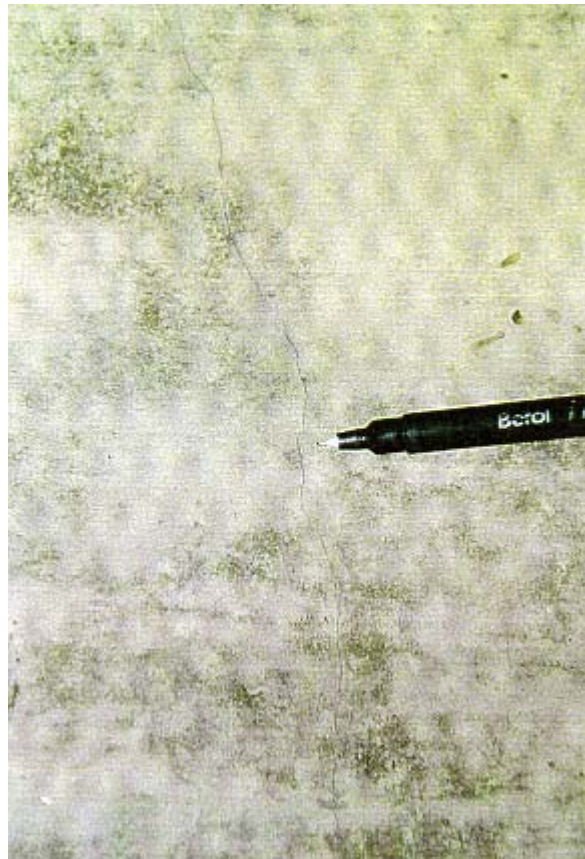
Vertical shrinkage crack in the sidewall of a concrete box culvert
